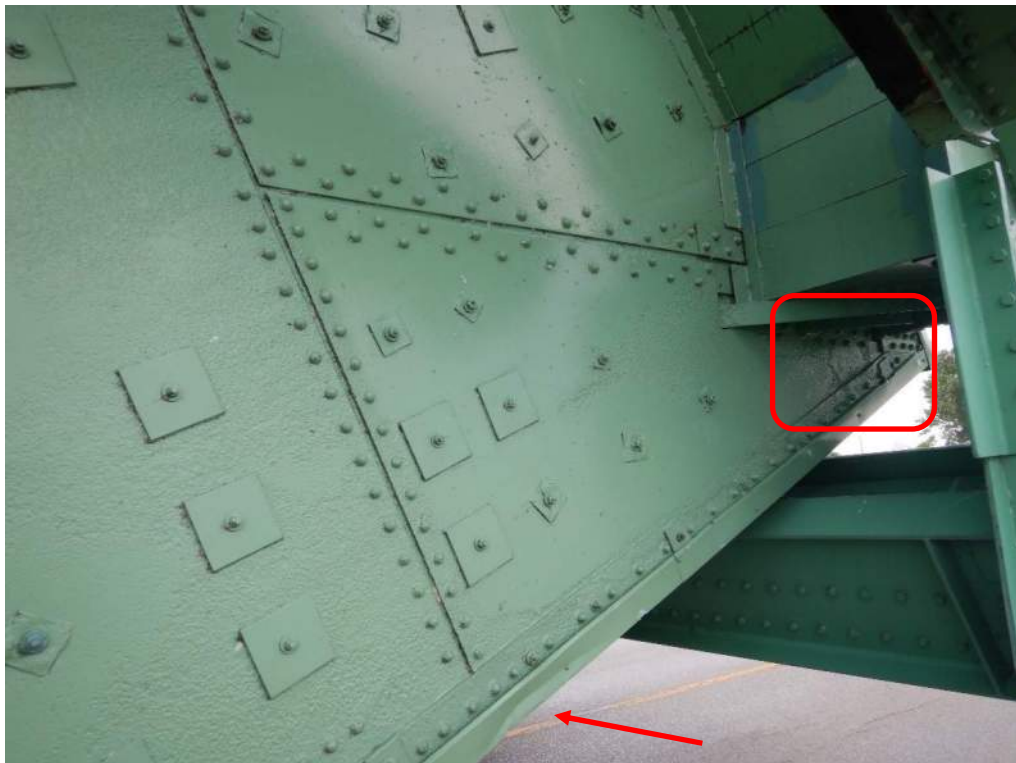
The north face of the counterweight exhibits light pitting throughout, some localized areas of deep pitting, and an area of impact damage at the northwest corner (photo taken when bridge in open position).
